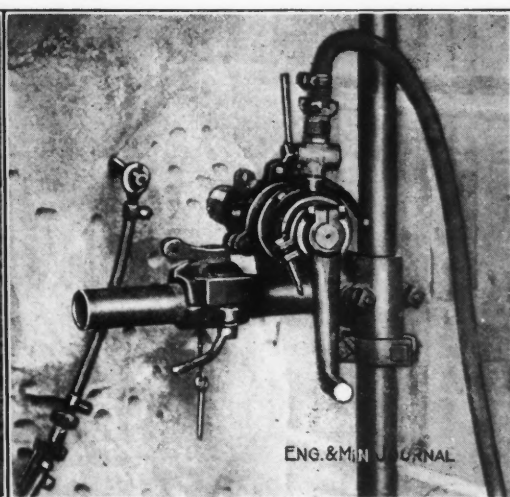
DRILL SWUNG TO ONE SIDE FOR EXTRACTING STEEL
